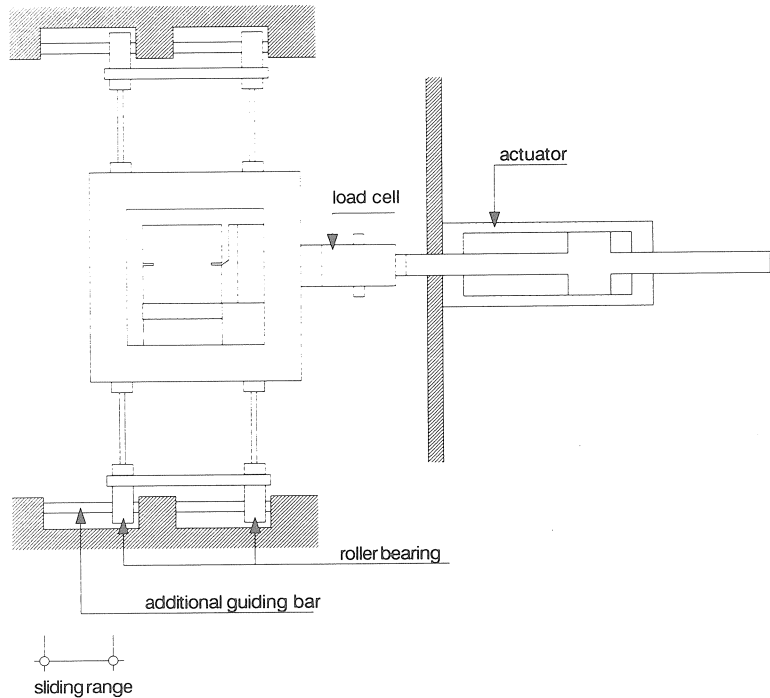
Roller bearing guiding unit for large displacements of the frame.
